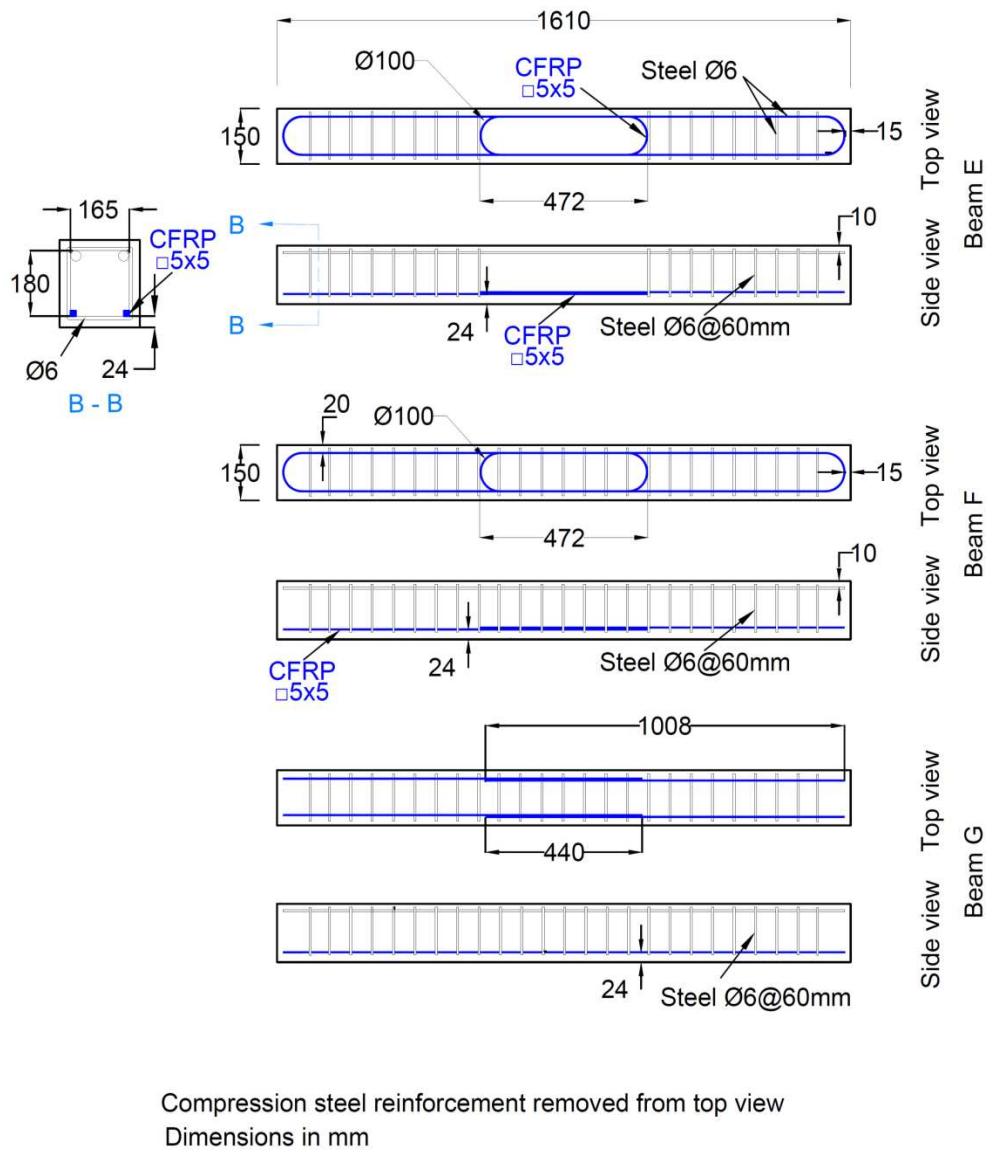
Test specimens and reinforcement arrangement of phase II specimens.
